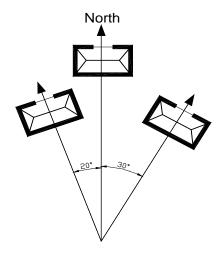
Desirable range of window orientation for north facing windows.
